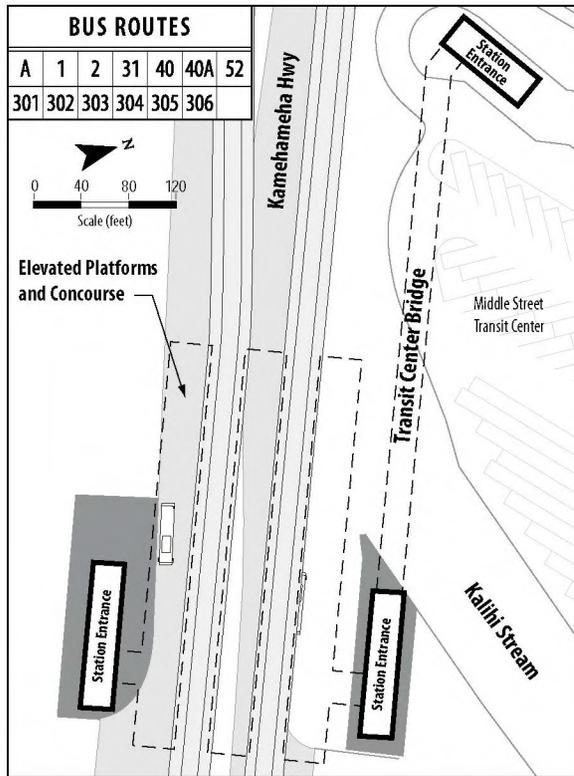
Middle Street Transit Center Station (All Build Alternatives)
